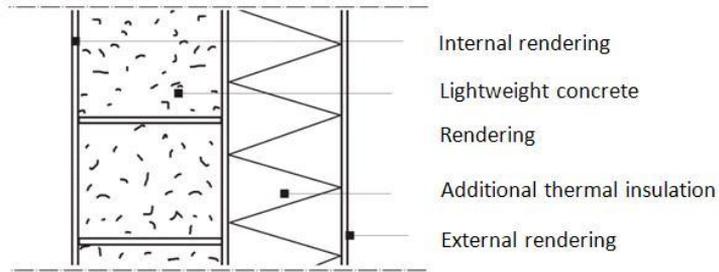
Light-weight concrete wall. Original structure and renovation with additional thermal insulation.
